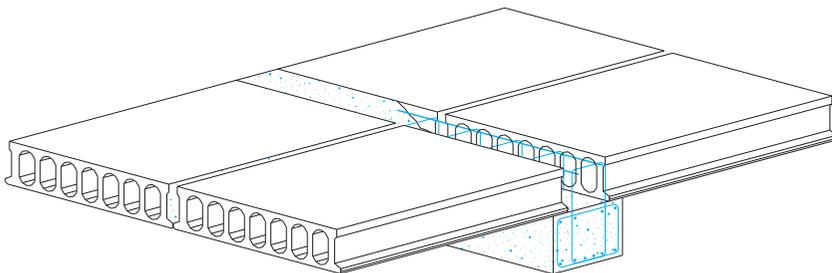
Beam previously cast in situ to be self-supporting of the dead weight of the floor itself and the finishing casting.
